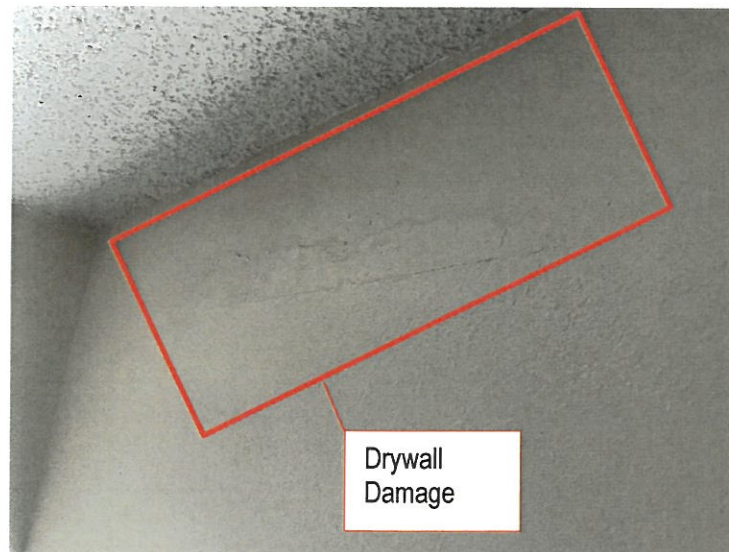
Visualization of Drywall Damage, Unit 204-08
